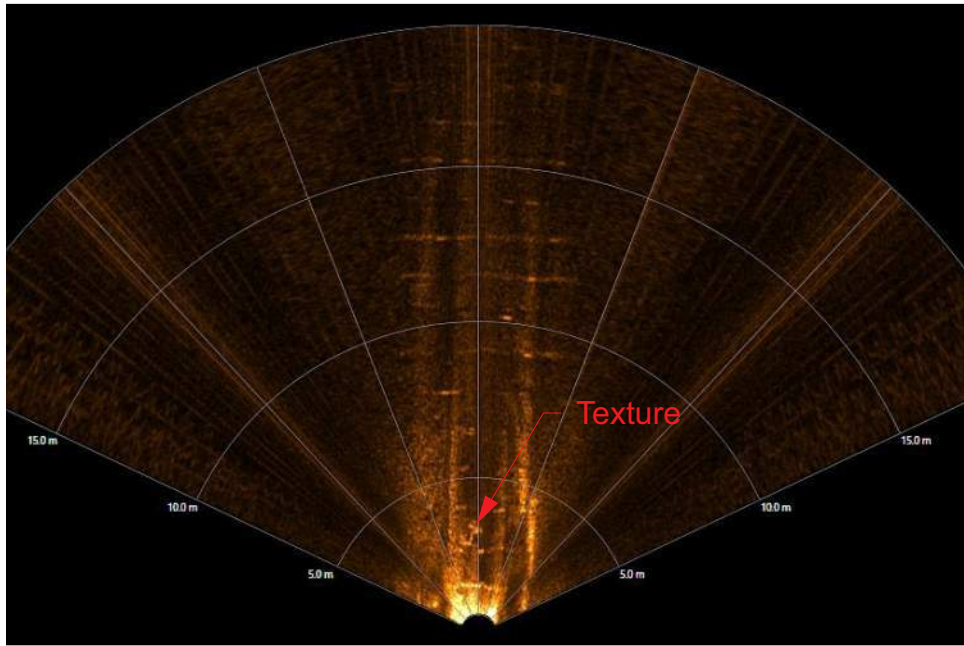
Sonar image at 457 feet downstream of Access Point 1. Texture on invert 8 feet ahead.
